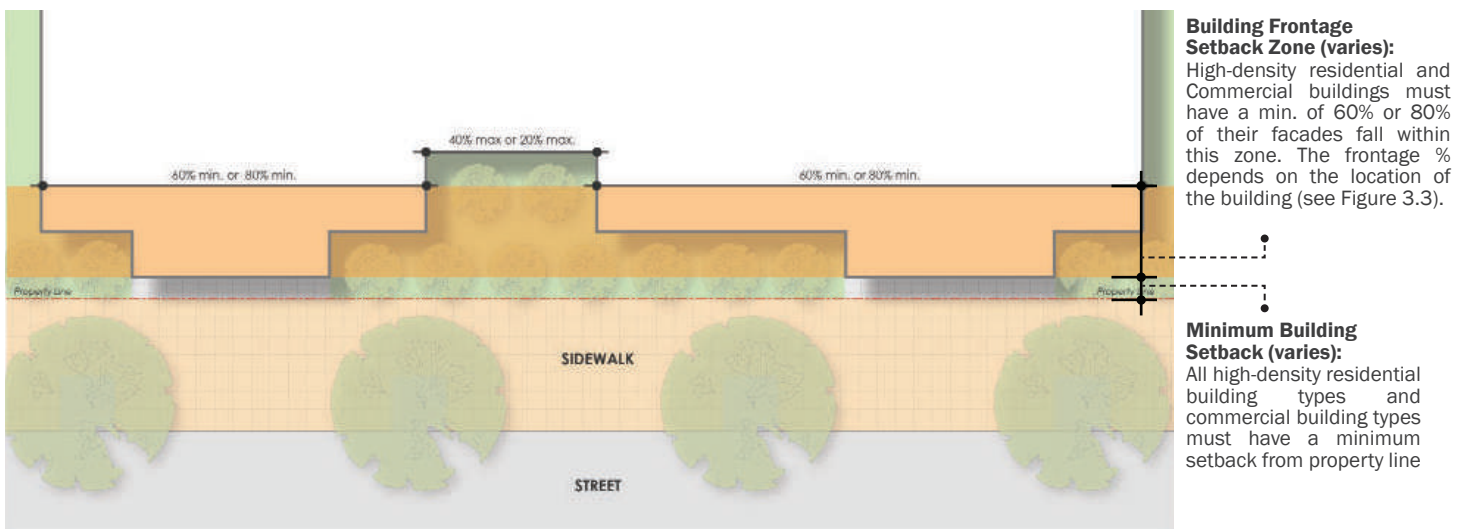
BUILDING SETBACKS AND DETAILED FRONTAGE
